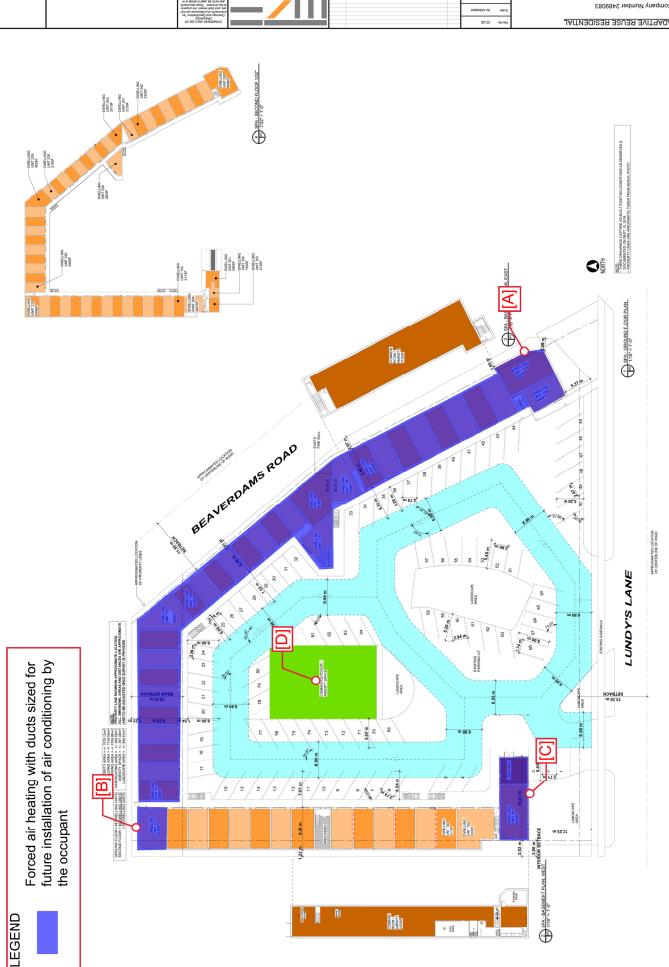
Proposed Site Plan Showing Prediction Locations (6-Storey Building)
